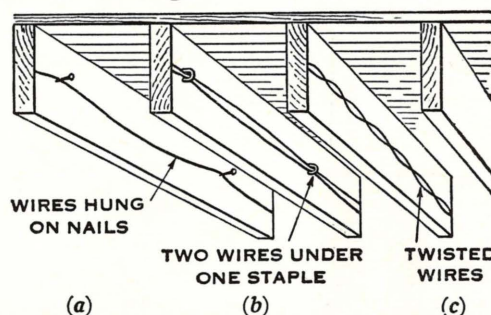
Some things NOT to do when wiring a door bell circuit. (a) Hanging wires on nails. (b) Two wires under one staple. (c) Twisted wires
